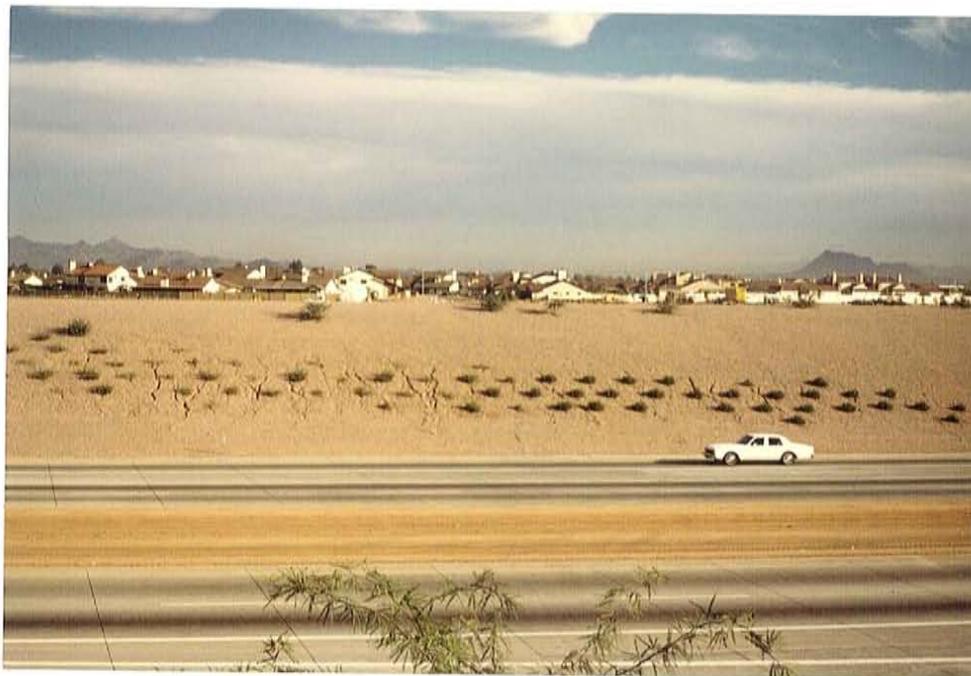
Dlope Damage SR 360 West of Val Vista Road.
